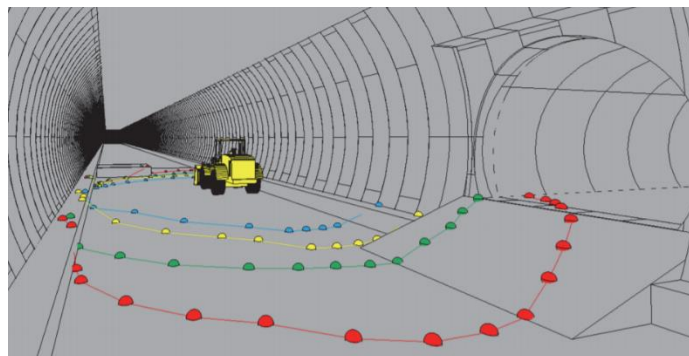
Model-supported planning of working safety (protection zones). Source: DAUB 2018 Recommendation BIM in Tunneling
